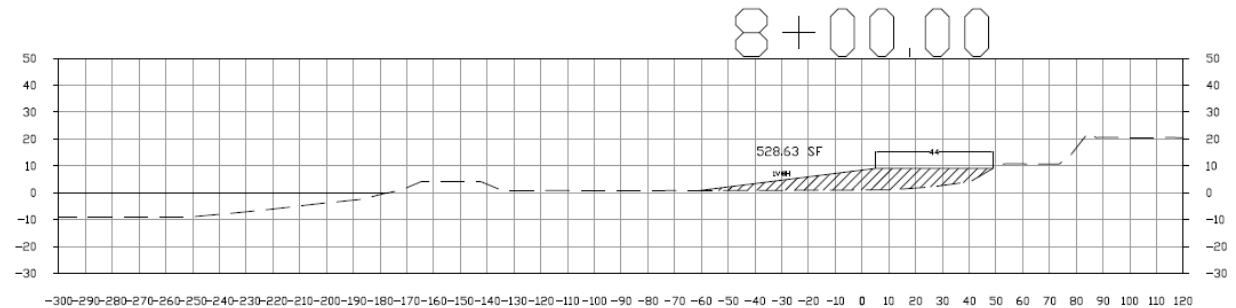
(d). Typical beach fill cross-section at Sta 8+00
